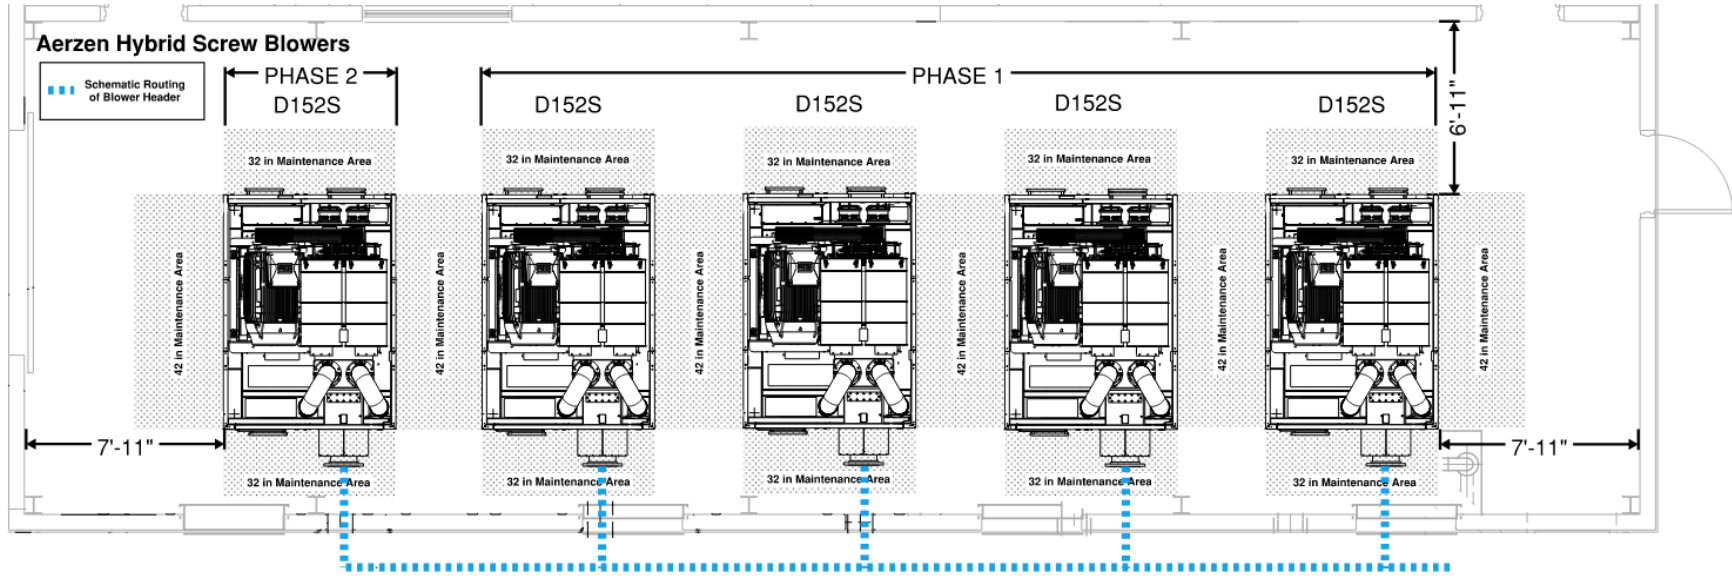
Hybrid Rotary Screw Blower Alternative Blower Room Plan
